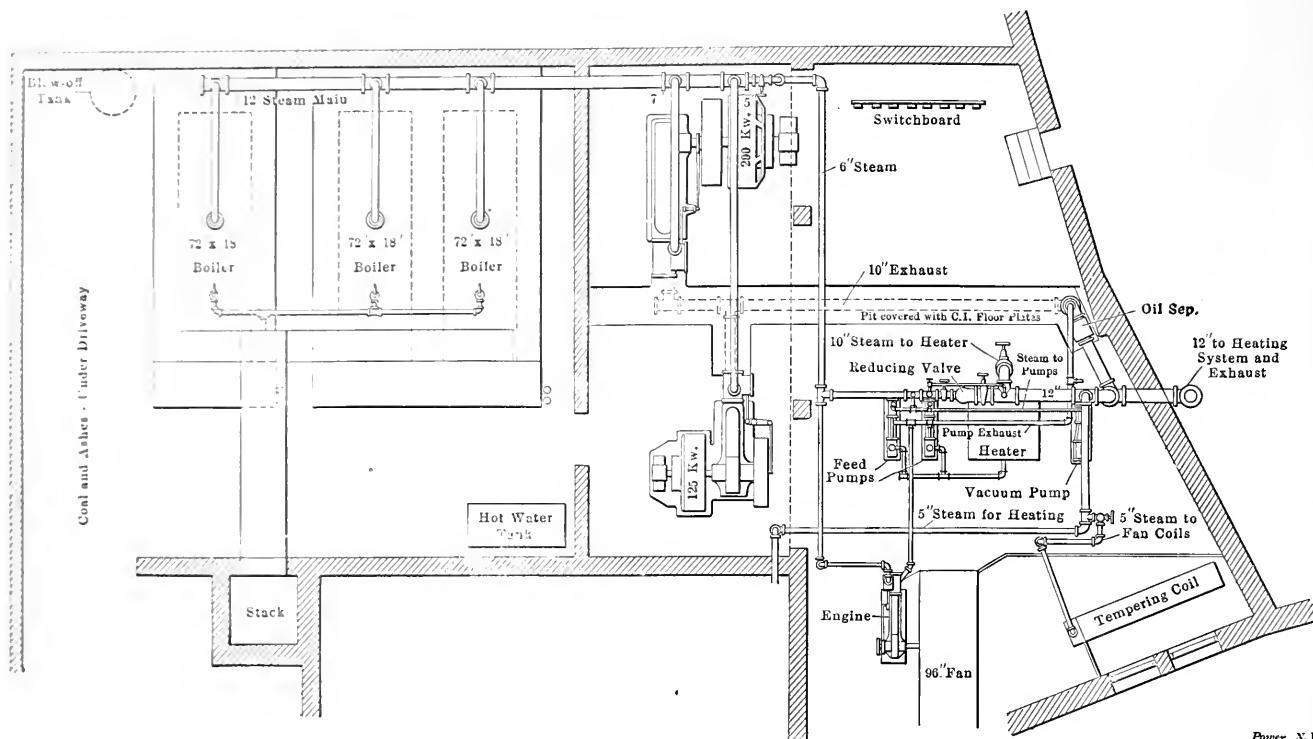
PLAN OF ENGINE AND BOILER ROOMS
